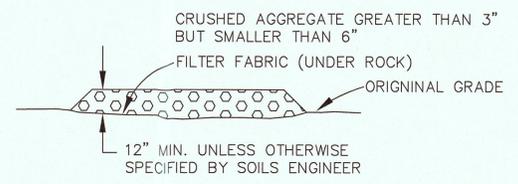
STABILIZED CONSTRUCTION EXIT
